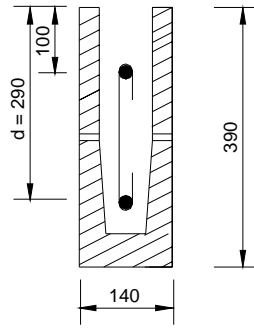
Masonry beam dimensions and reinforcement arrangement
